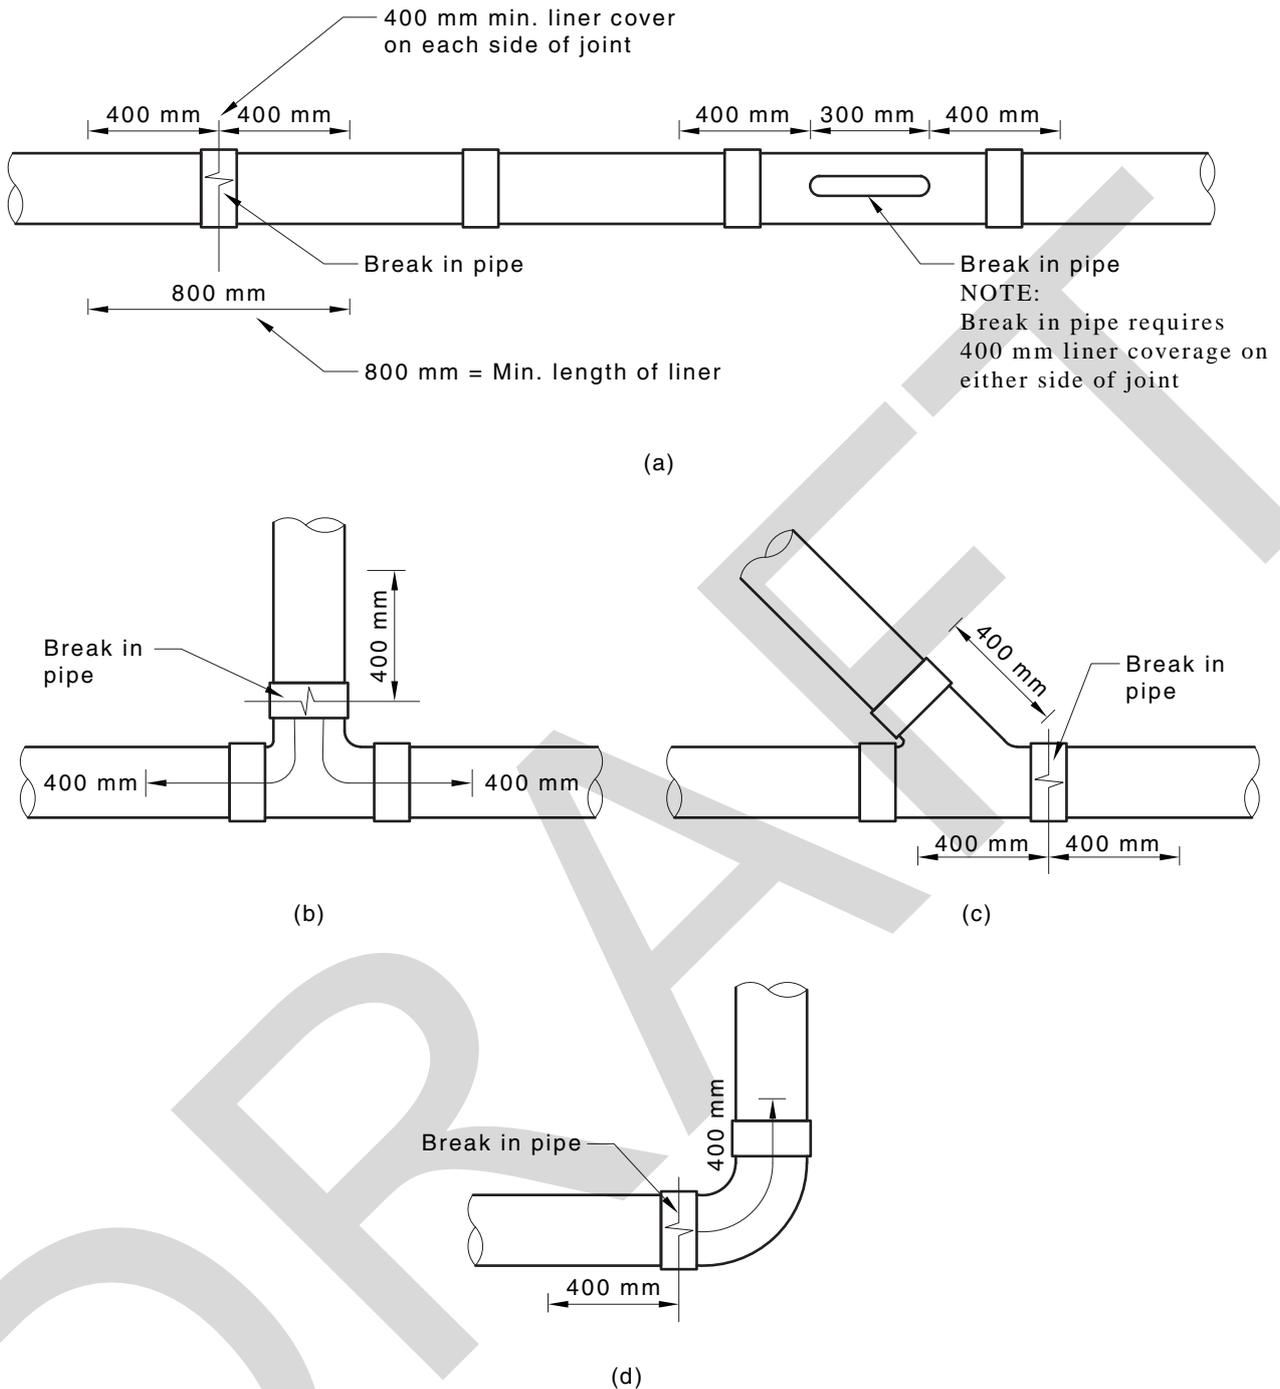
MINIMUM LENGTH OF LINER FOR A DAMAGED PIPE OR FITTING
